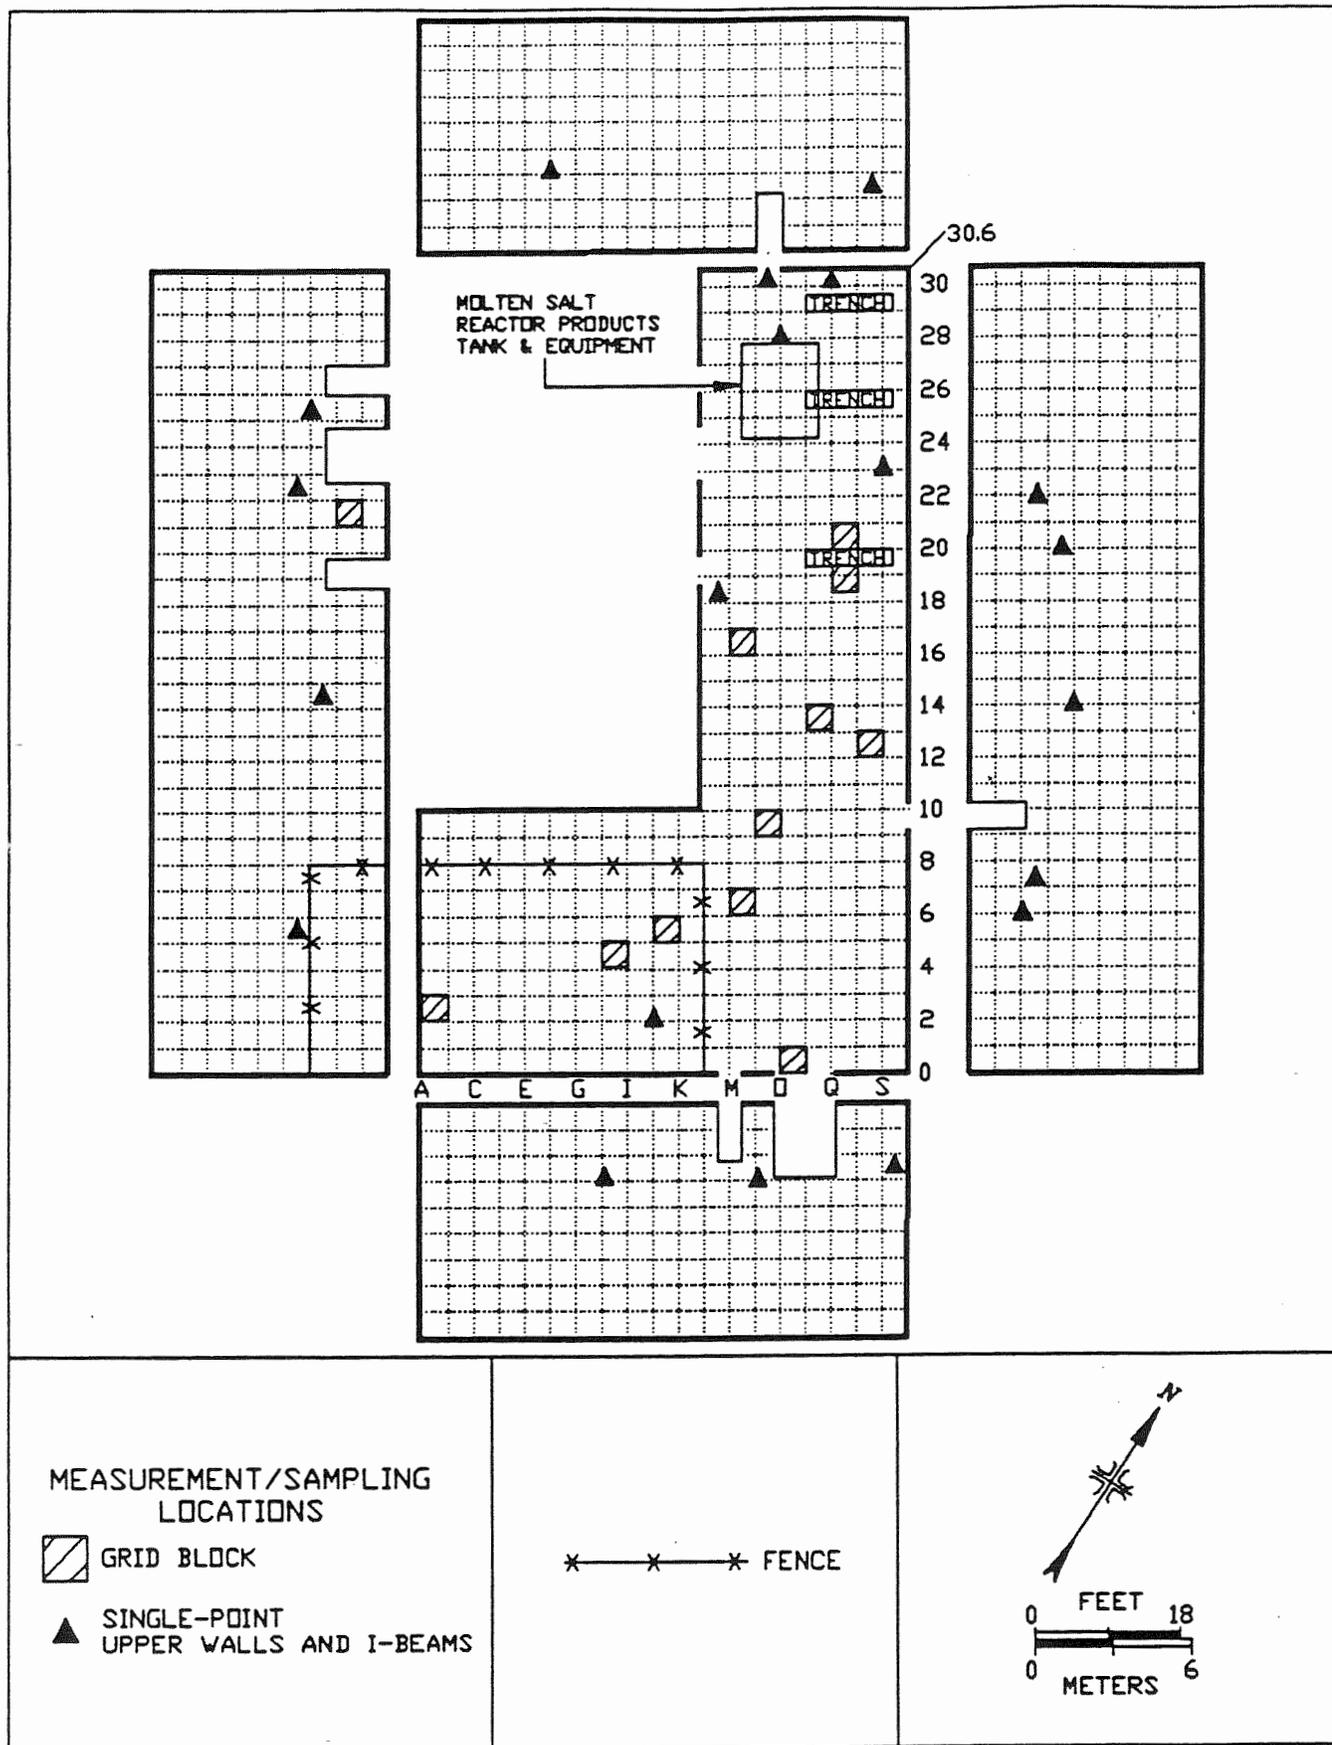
Building 005, Room 105/112 - Measurement and Sampling Locations
